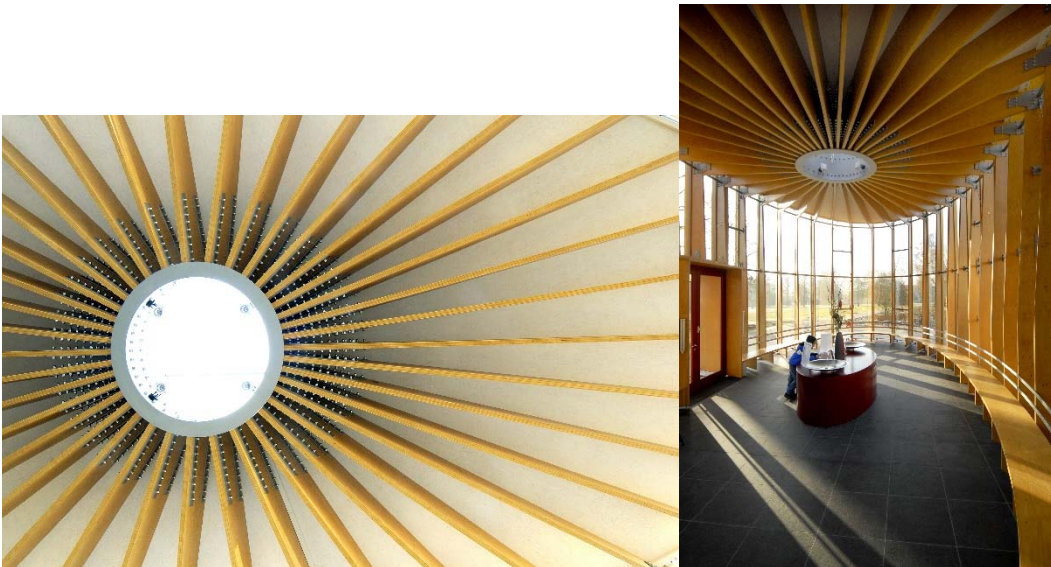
Kurpark Wuellpavillon (Bode Petters Architekten) in Germany uses Kerto-Q in radial rafters and wall columns. Photo: Hanns Joosten.
